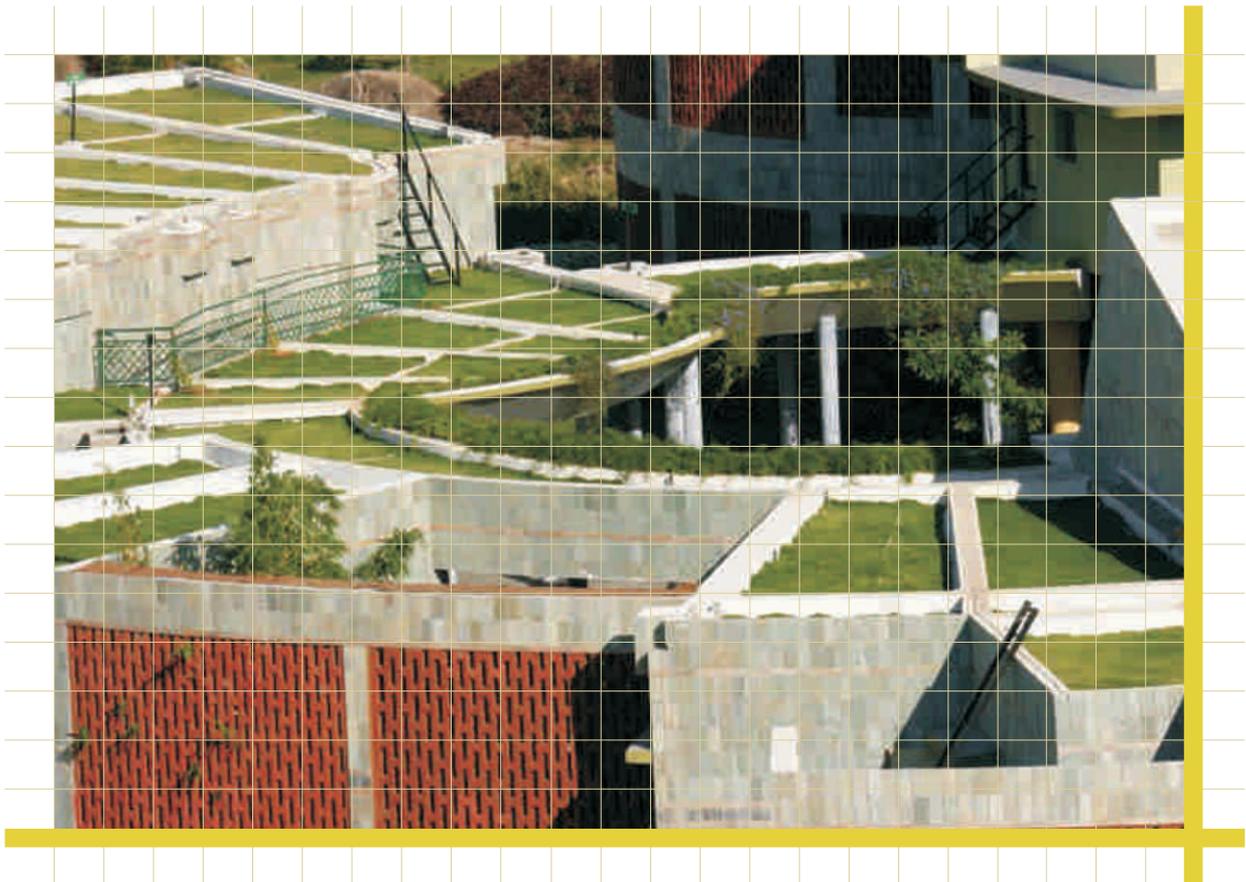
Green Vegetative Roof – Modular Block Roof System (Figure courtesy of CII Green Building Centre, Hyderabad)
